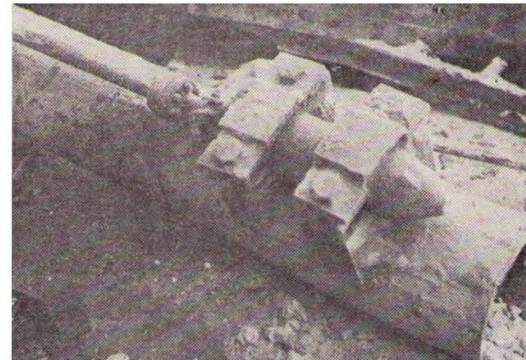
Equipped with a vibrobullet bottom concrete pipe
